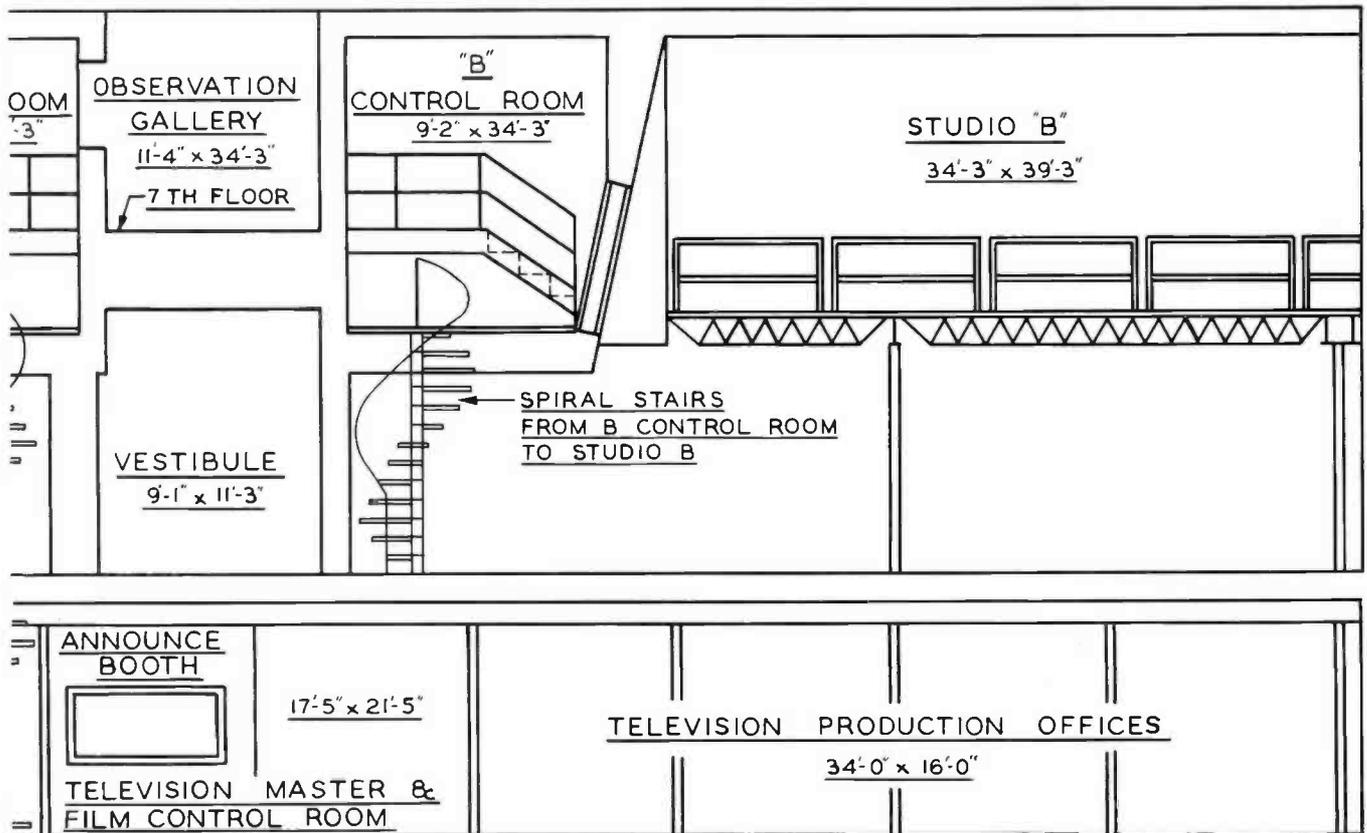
(above). Elevation view of the 5th, 6th and 7th floors of the WCAU Building. Note spiral staircase providing quick passage between floors.
